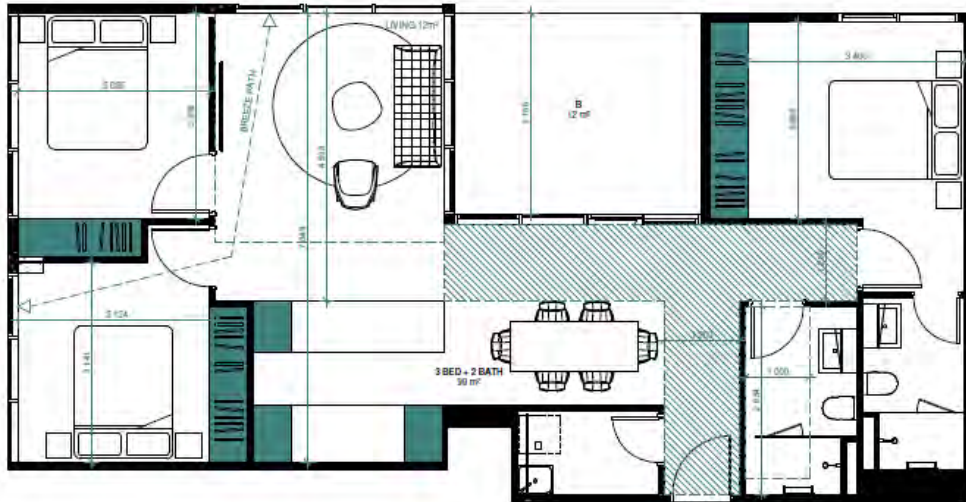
Dwelling Type T05 (source: application plans prepared by Plus Architecture)
